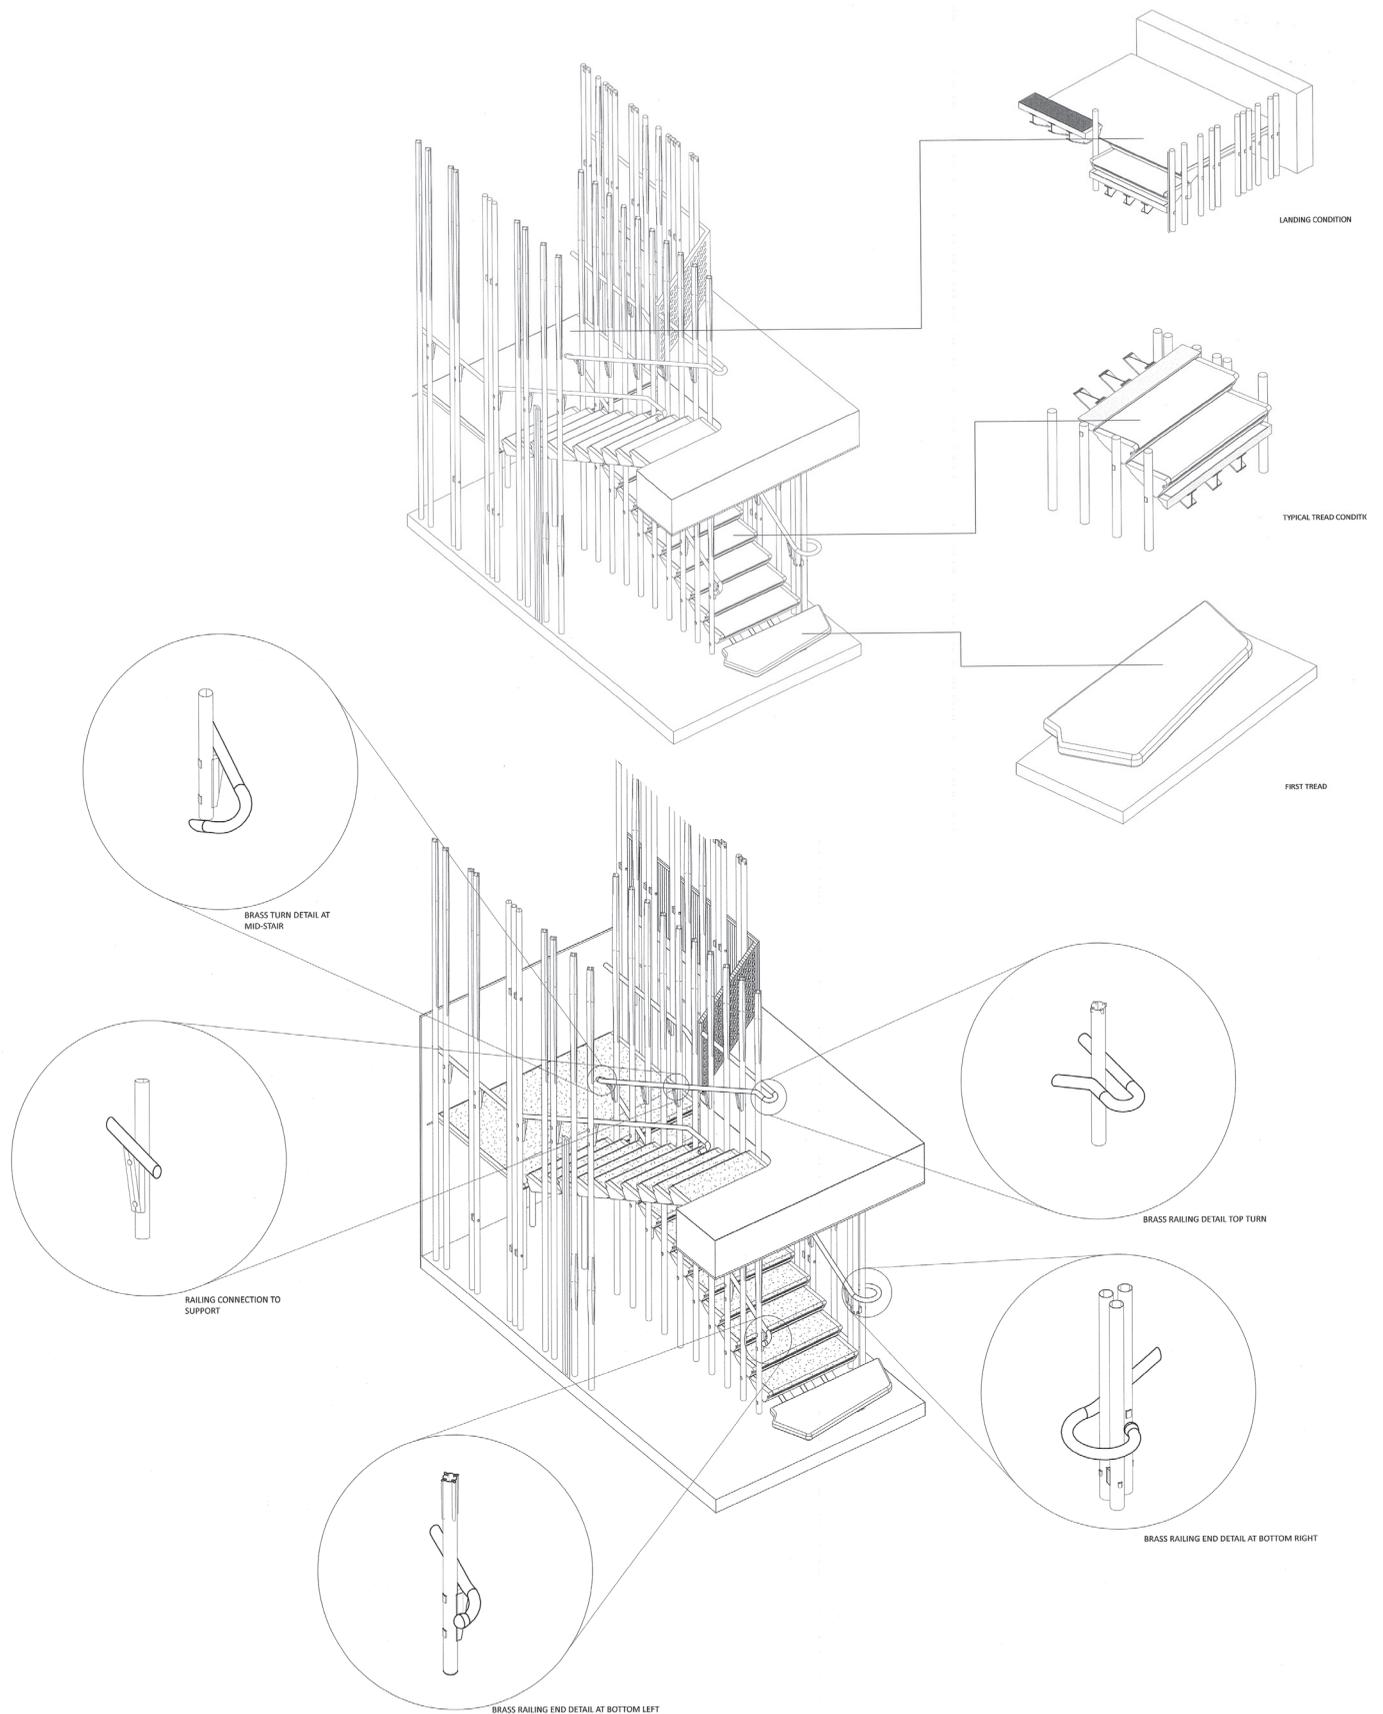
Digital reconstruction of Villa Mairea main stair in Revit
